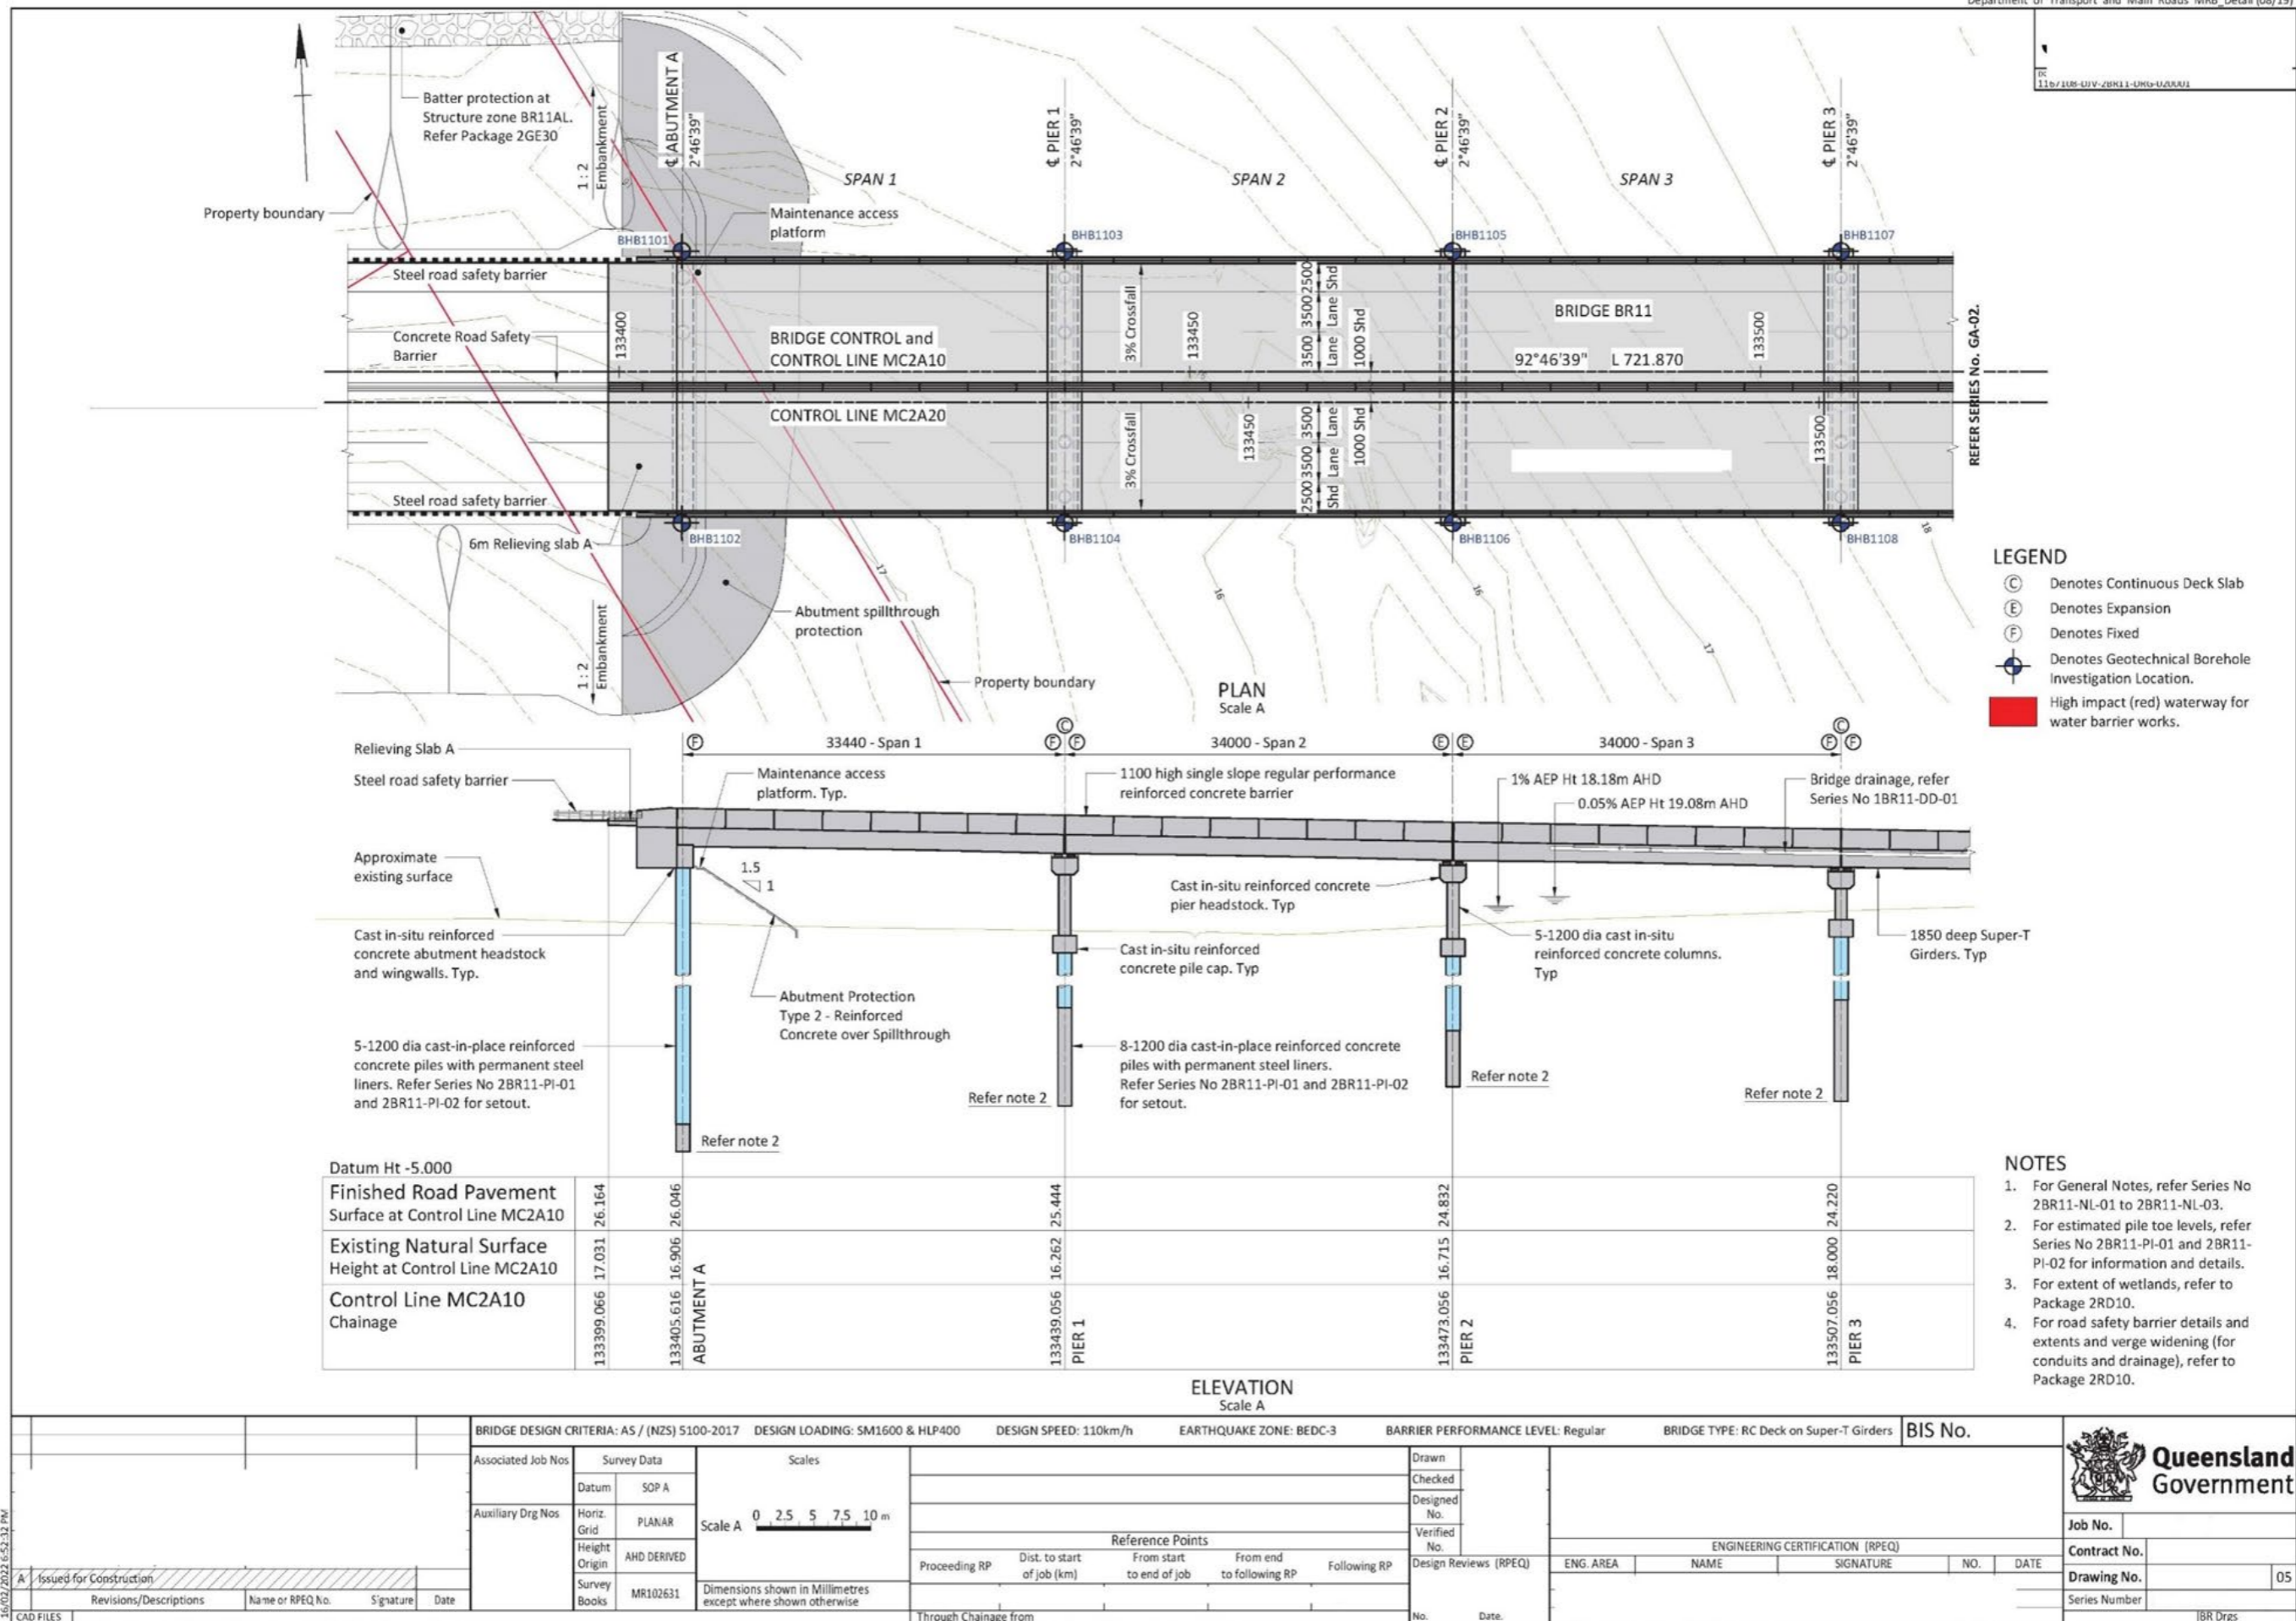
(e) - Example General Arrangement drawing 2 of 5 for Super-T girder bridge
